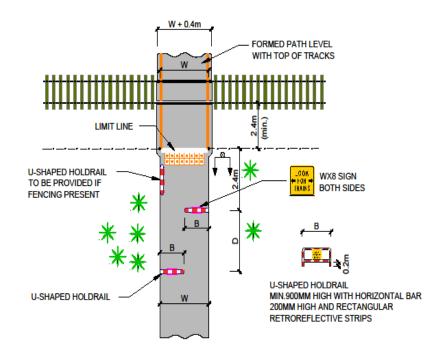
Layout plan for a handrail deflection chicane (Figure 48 in the KiwiRail guide)
